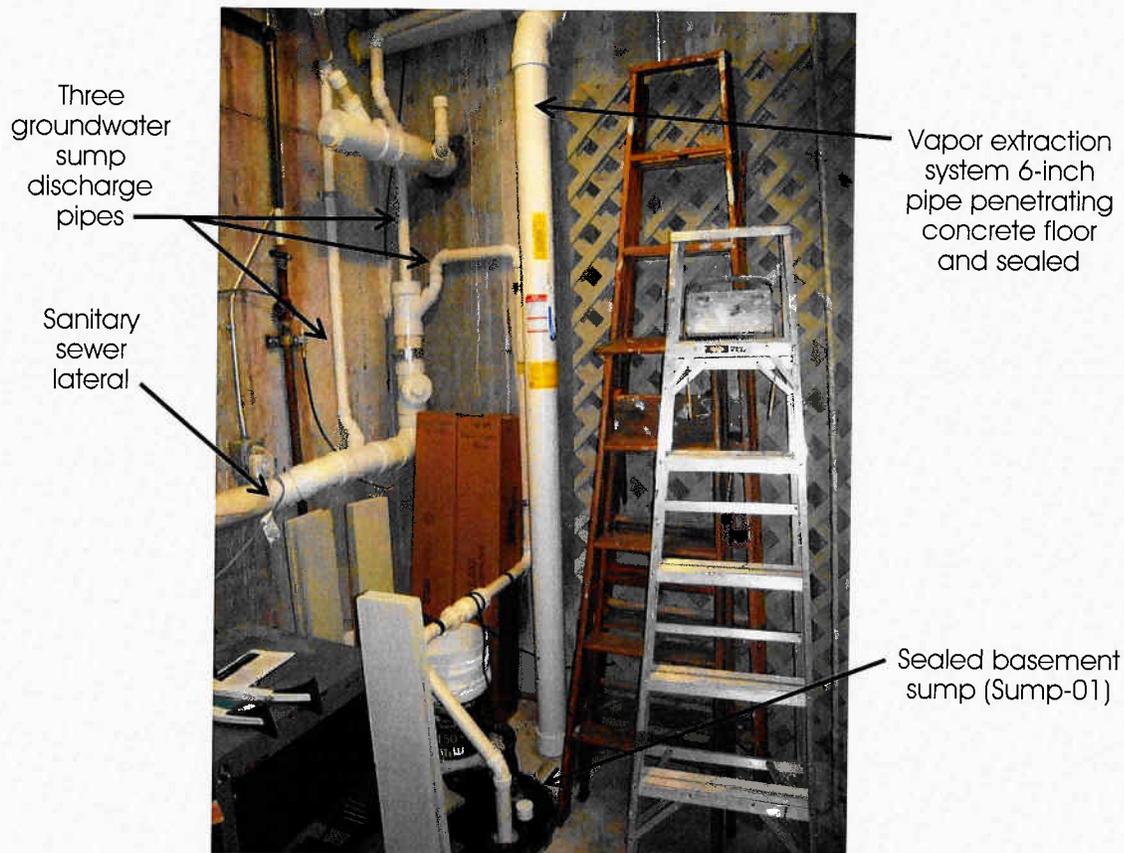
Photograph of groundwater sump system and vapor extraction system in the northwest corner of the building basement
